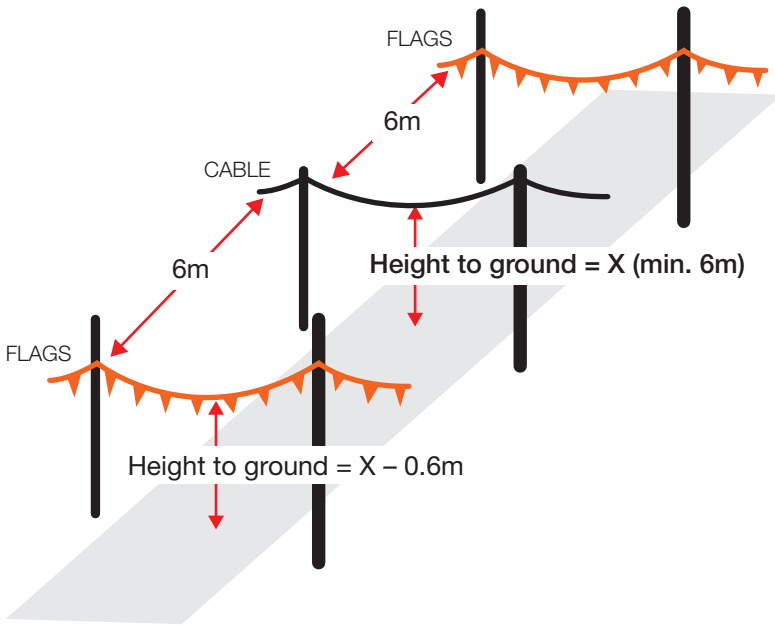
Cables crossing roadways must have warning flags 6m either side of the cable, at least 0.6m lower than the cable.
